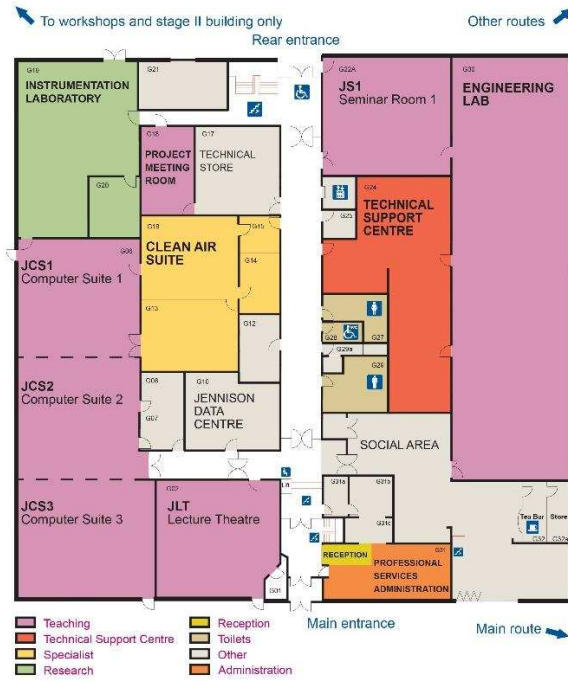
Floorplan of the Jennison building Ground floor, section 1
